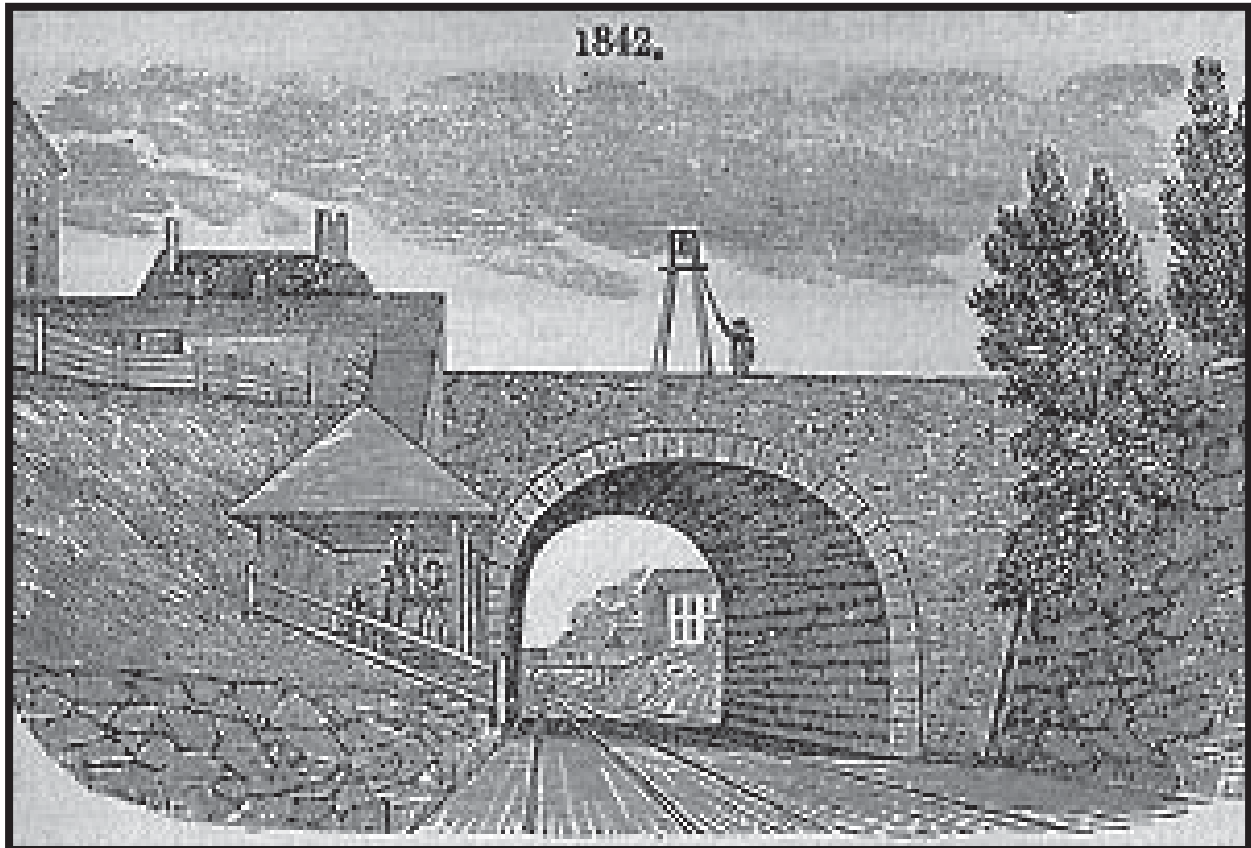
Camden and Amboy Railroad, Stone Arch Overpass near Bordentown, New Jersey. 1842 (Source: Barber and Howe 1844:99).
